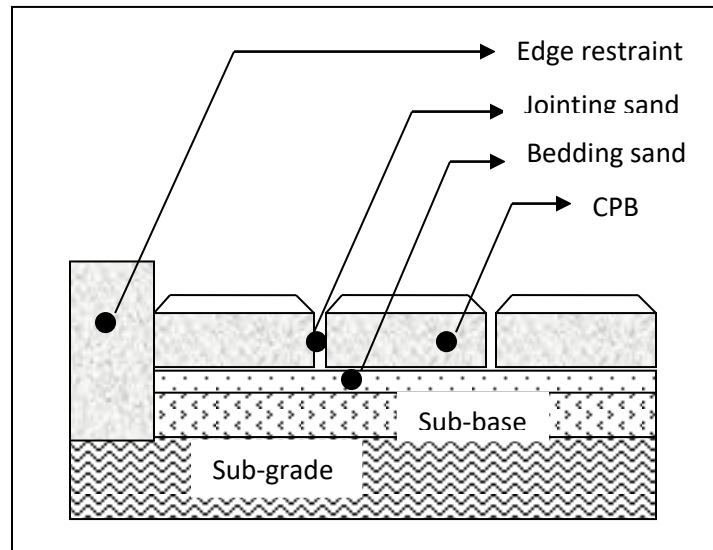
Principal elements of a concrete block pavement (Ling, 2008)
